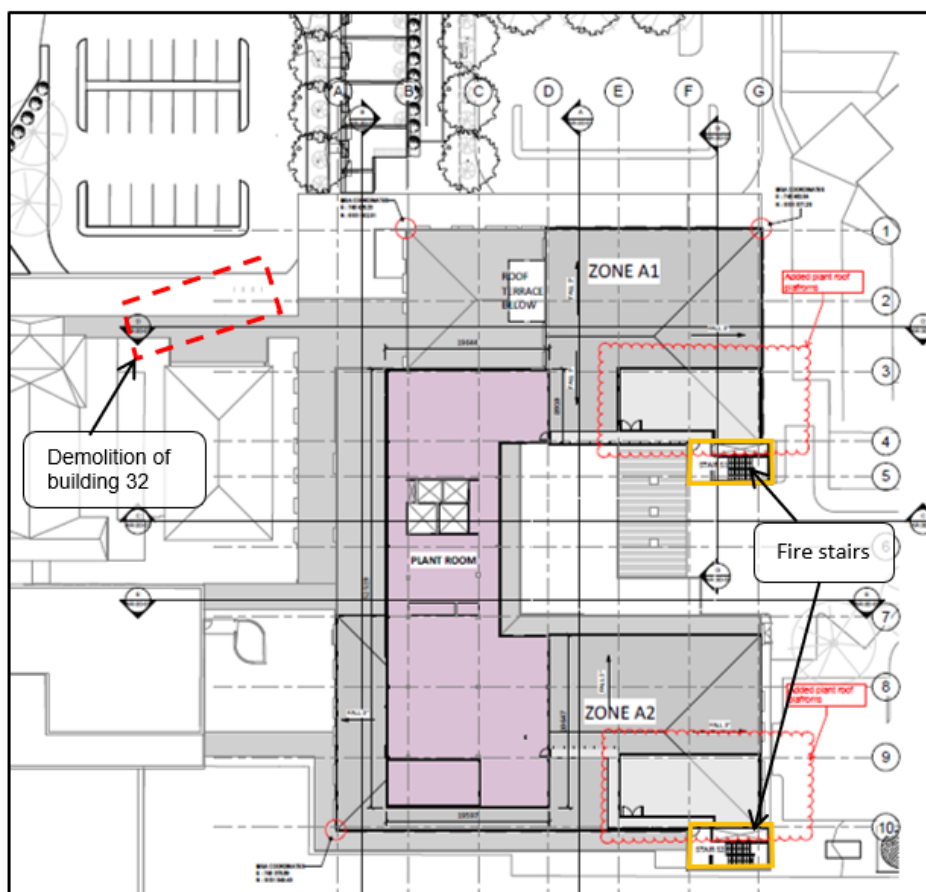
| Approved level 3 plan (Source: Modification 2 Application)
